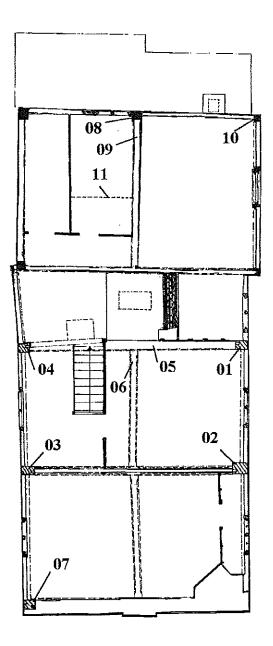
Plan of the first floor of Brockley Hill Farmhouse, showing the locations of the timbers sampled for dendrochronology
